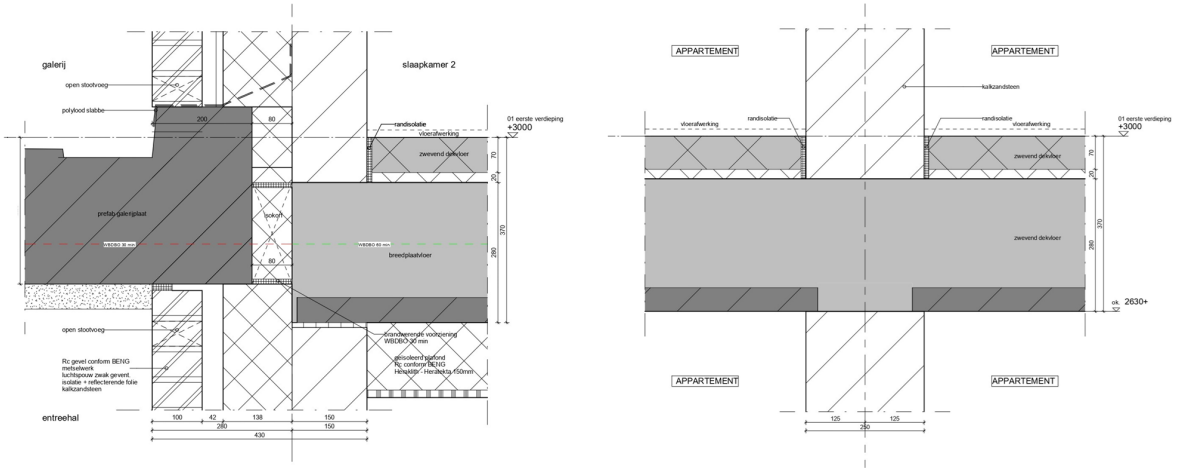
Details of a gallery connection via thermal break elements (left) and of the connection between the walls and floors of the main building (right) (Venster Architecten, 2024).
